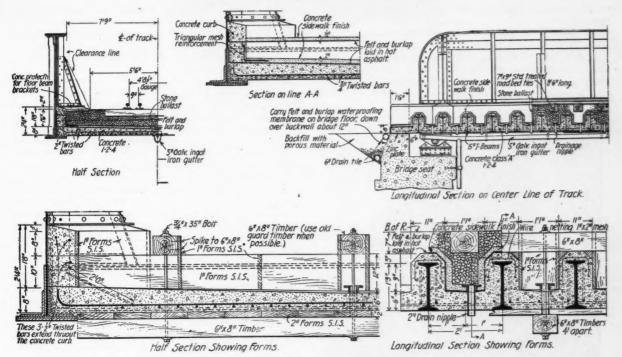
Type "B" Floor for Through Plate Girder Bridges.
